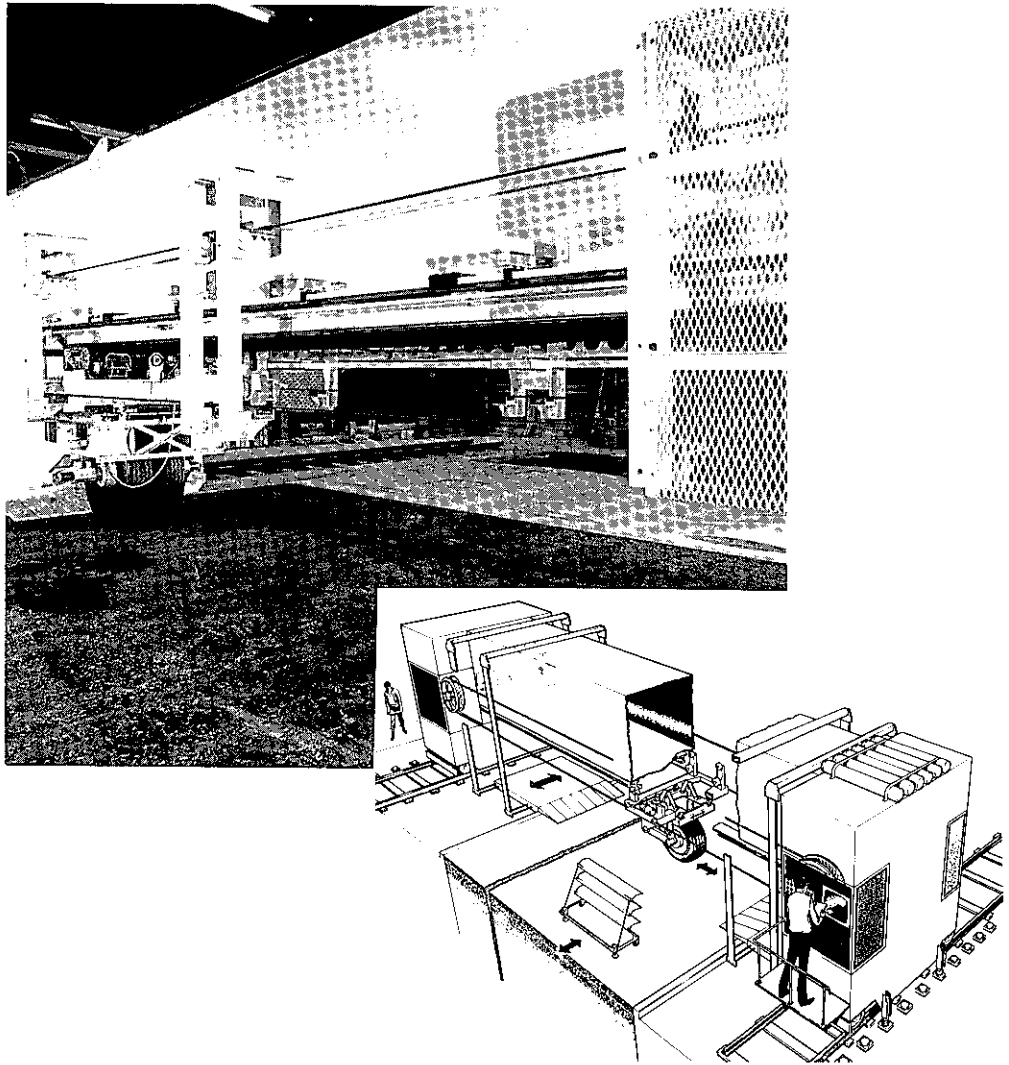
The British Pavement Test Facility (PTF) - a linear accelerated loading machine.
